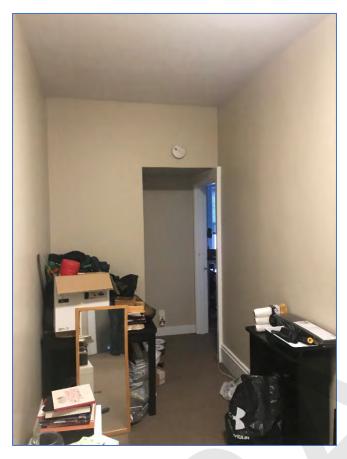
View of hallway located on the north half of the apartment which provides access to Bedroom 2 and 3
